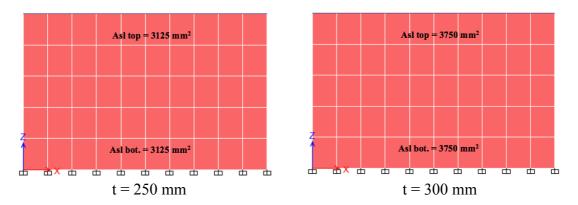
18: The effect of thickness of shear walls on the steel reinforcement of shear walls
